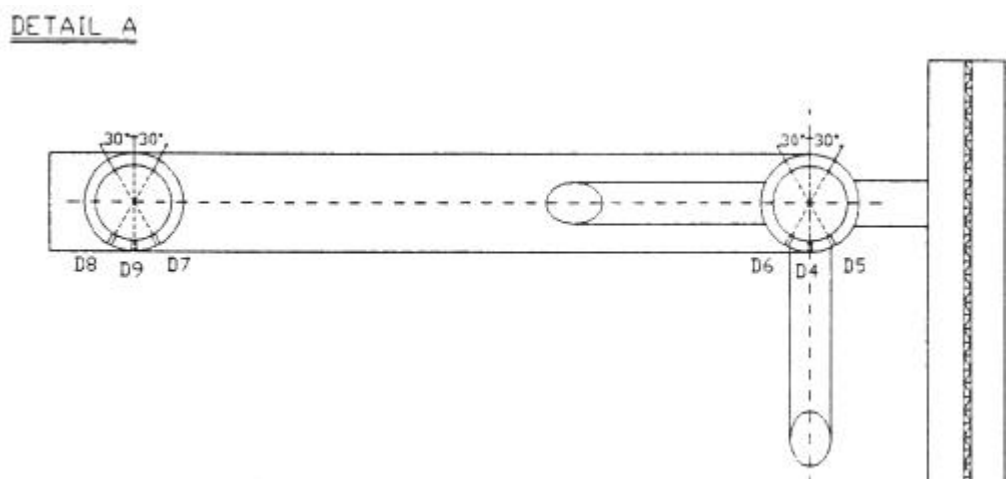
Detail A: Upper gate girder [Klatter et al, 1994]
